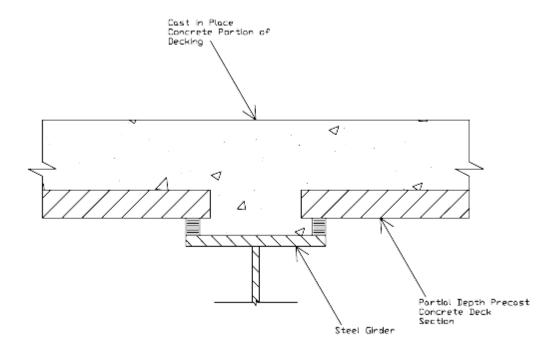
Diagram of Bridge Deck Employing Partial Depth Precast Concrete Deck Panel
